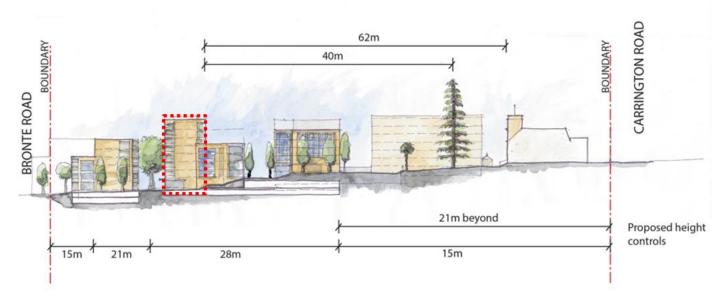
Bronte and Carrington Road cross section (28m / 6-8 storey building in red outline)
